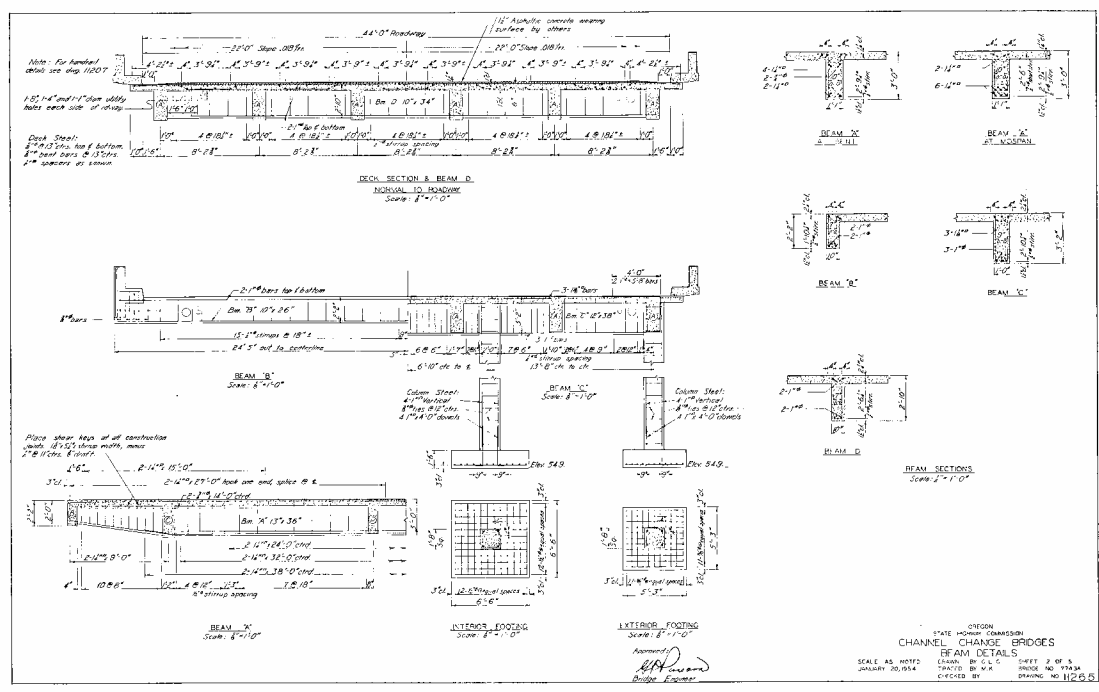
Girder details for bridge # 07743A (Drawing 11265).
